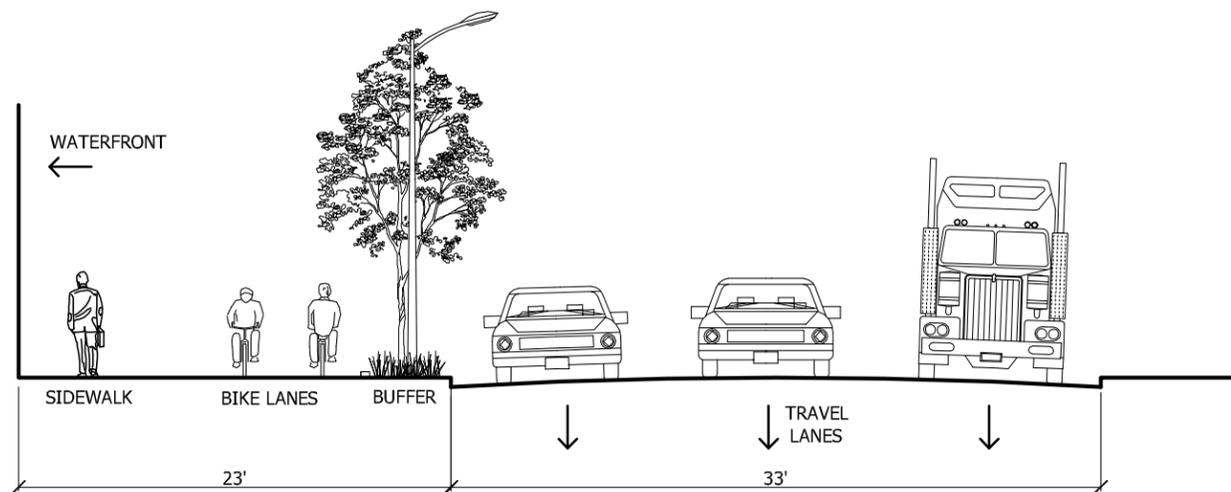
Possible Long-Term Configuration for Hamilton Avenue from Hamilton Avenue Bridge to 21st Street
